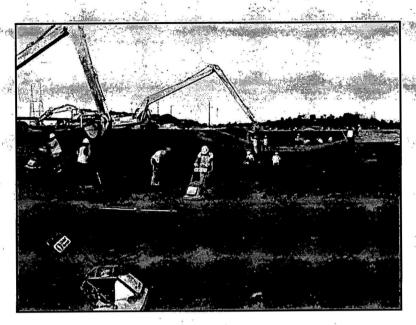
Backfill of trench after installation of Pipe 2 and catch basin CB2.
